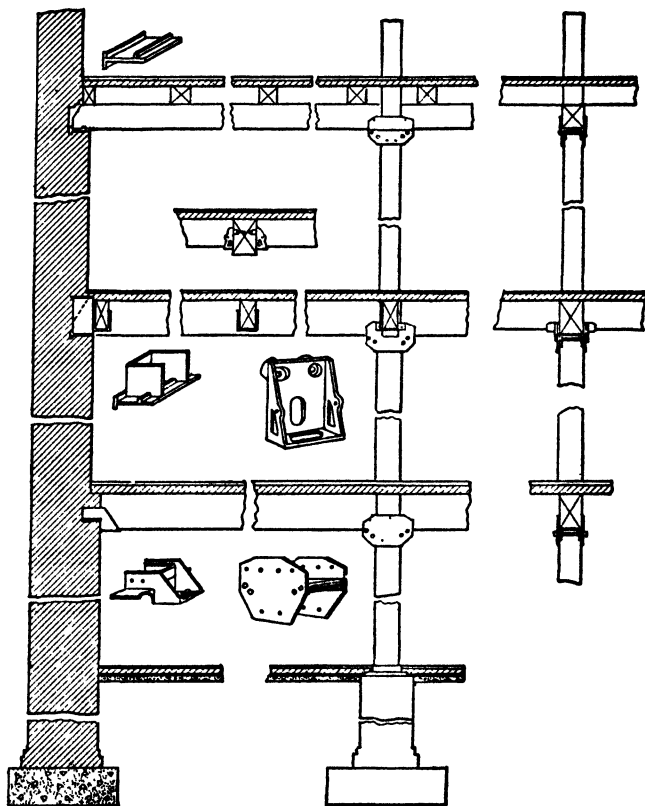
Mill-construction. Column, Girder and Joist-framing.
